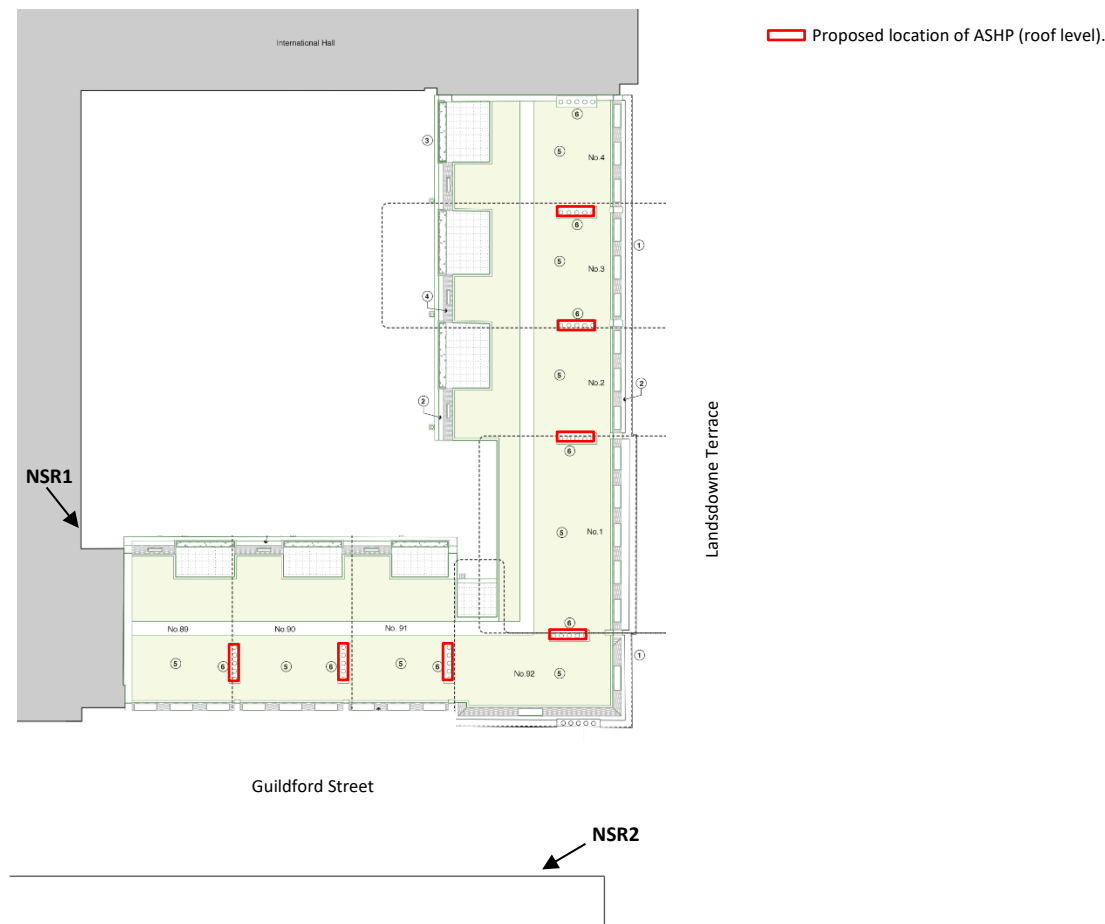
Proposed location of the 8 no. ASHP on the roof of the (proposed) new built top floor. Locations of NSR1 and NSR2 are also indicated.
